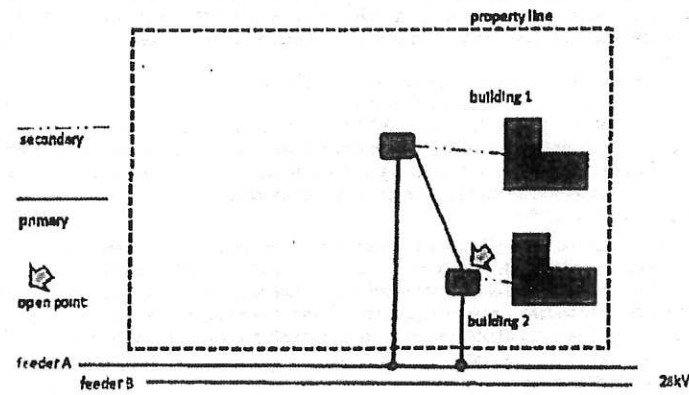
2 BUILDING CONNECTION greater than 1,000kVA
